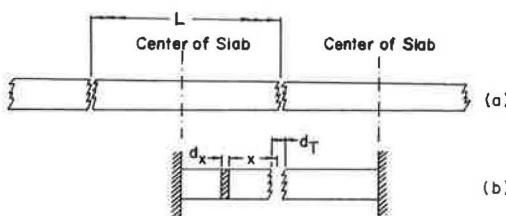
Transverse cracks in a pavement base; (a) cracked base, and (b) section considered for crack width calculation.
